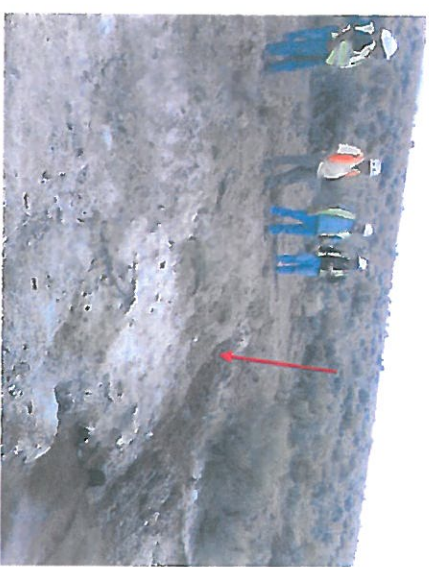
Seepage drain outfall at the downstream toe (3x12' HDPE pipes). There is reportedly a large seepage collection pipe under the dam. NOTE: Uncontrolled seepage exiting higher on the slope above the drain outfalls (red arrow).
